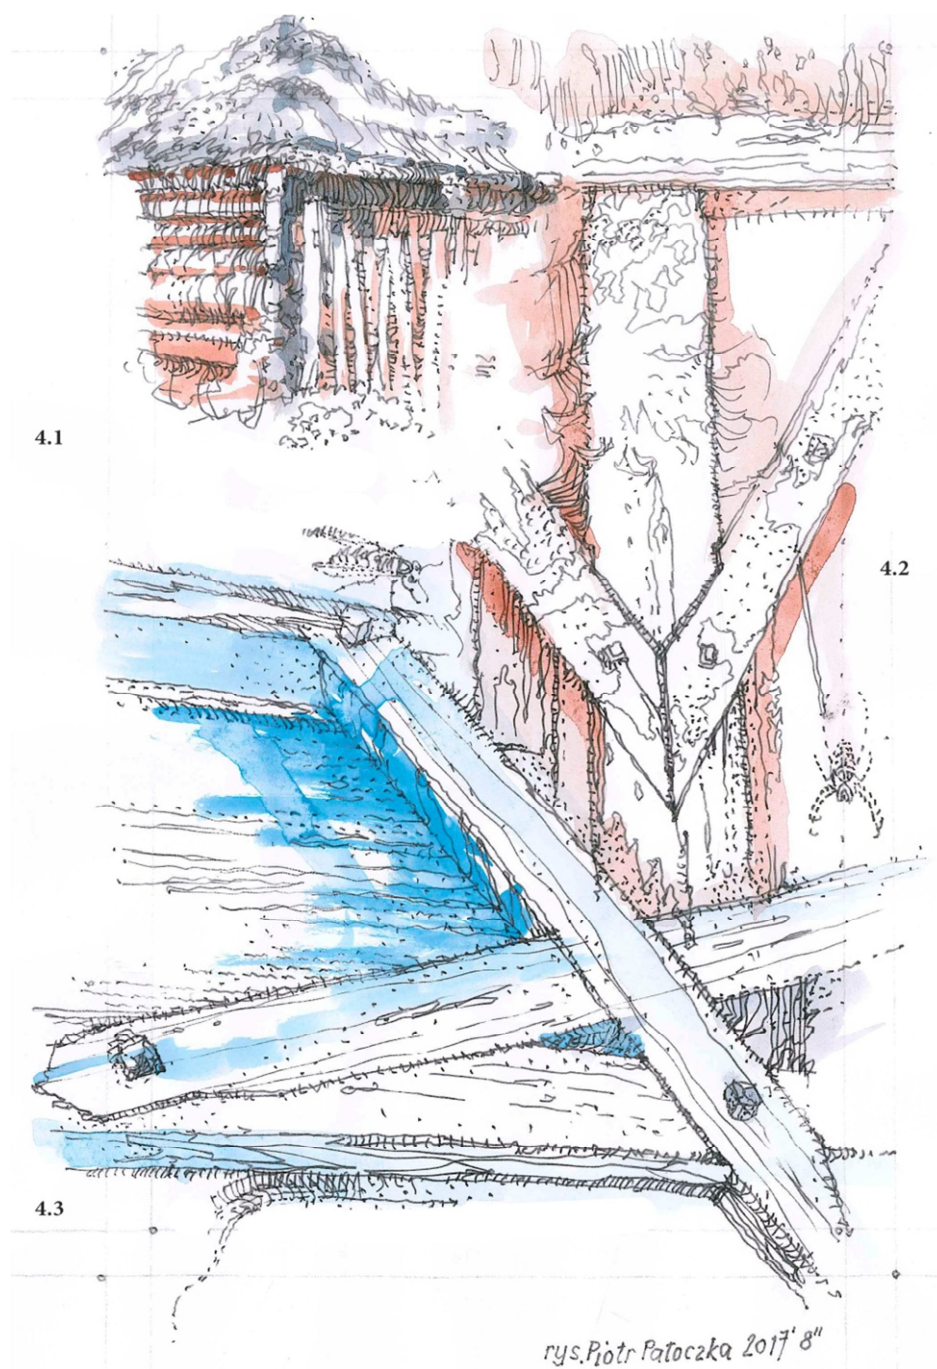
Wooden supports and joints. 4.1 Angle stone of a barn. 4.2 Supporting roof beams. 4.3 Double supporting roof beams. By P. Patoczka, 2017
